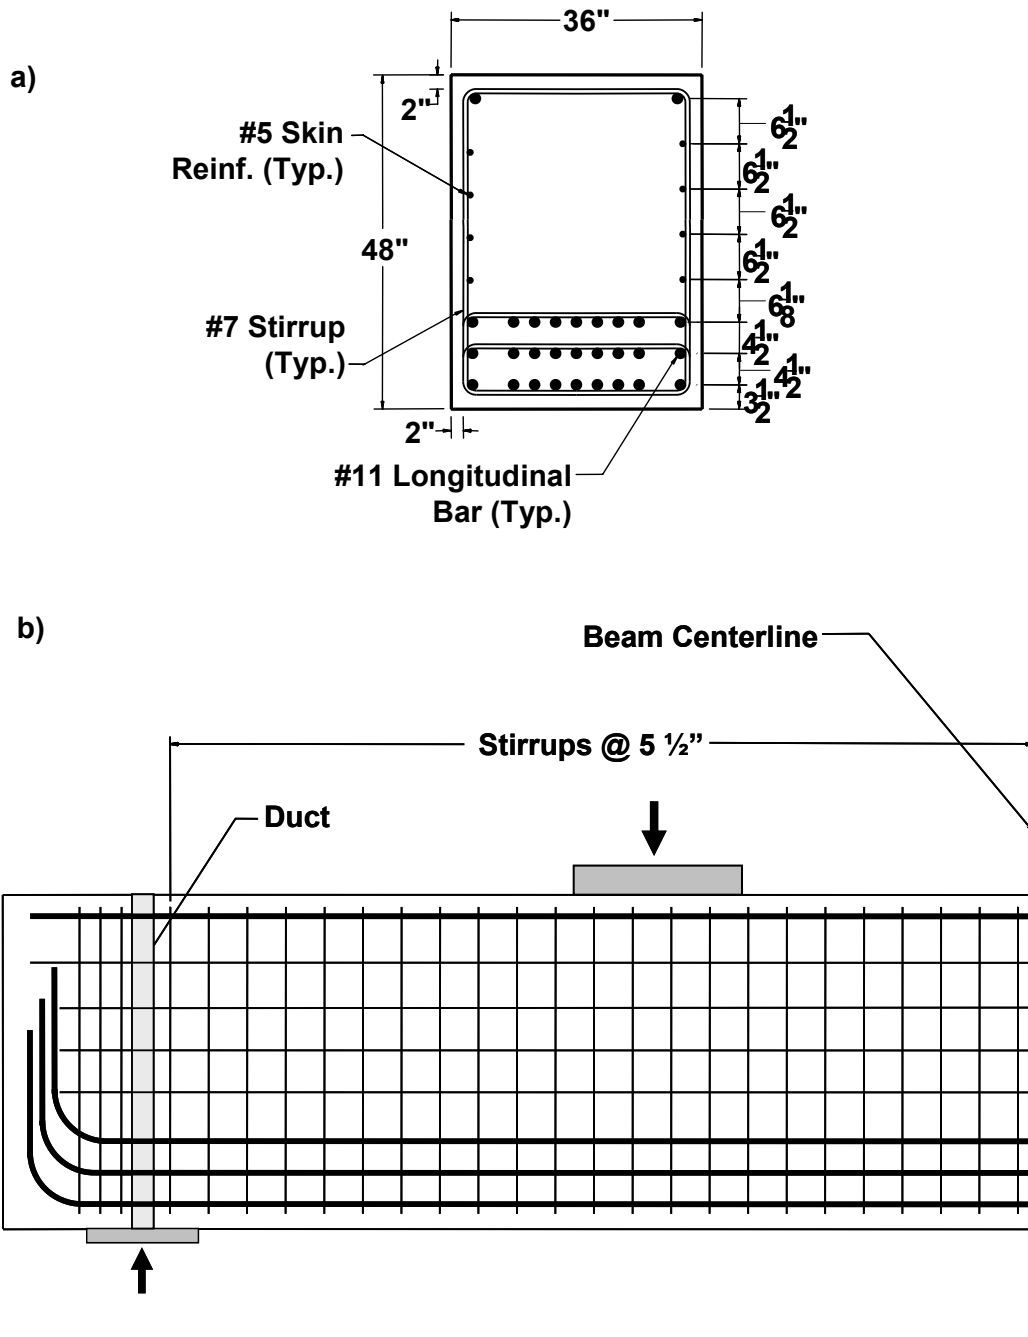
Shear span 2B a) Cross-section; b) Elevation
